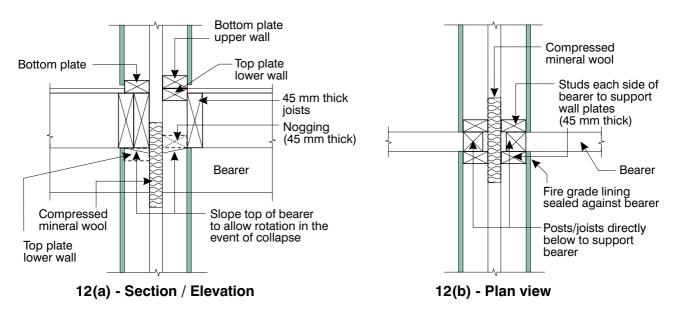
BEARERS SUPPORTED OFF SEPARATING WALL
